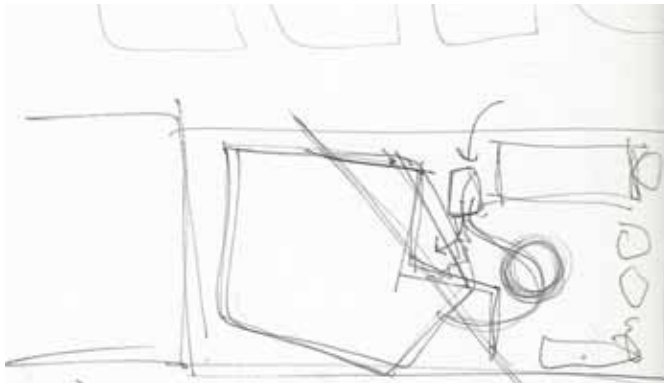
SITE PLAN REVISION 3 (AUTHOR, 2011)
